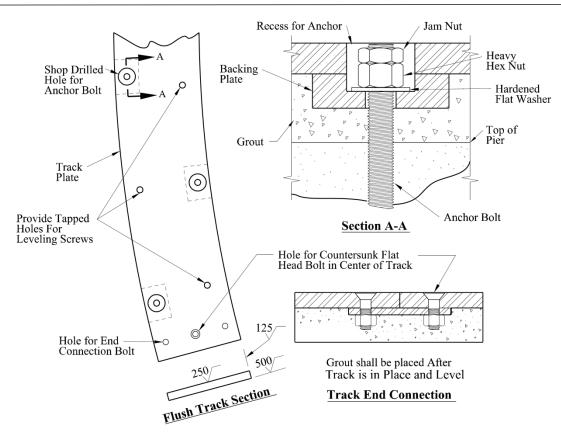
Typical Balance Wheel Assembly
